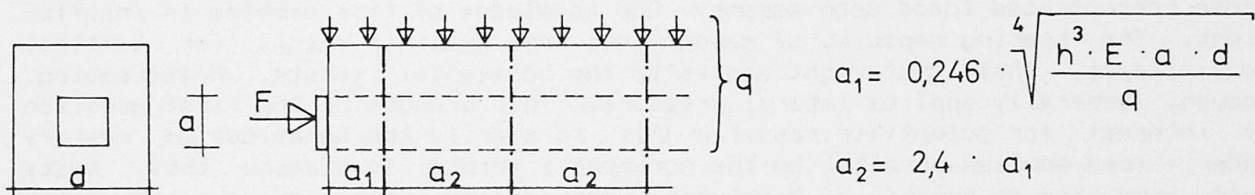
intervals between vertical reinforcement rods at the masonry wall crown
